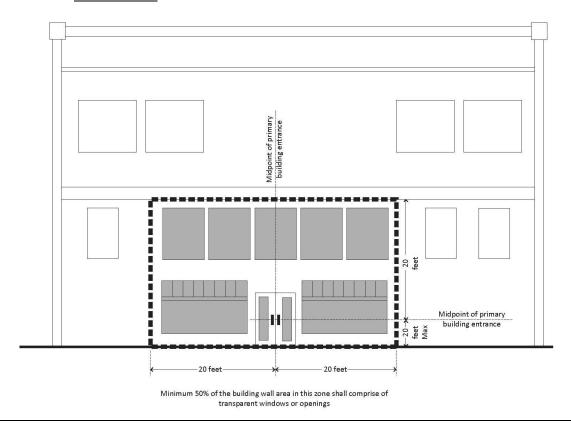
D: ELEVATION FAÇADE TRANSPARENCY AT PRIMARY ENTRANCE
